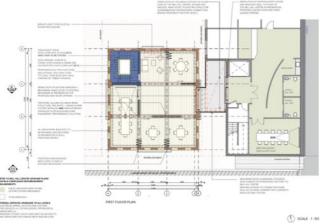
Proposed First Floor Plan, NTS. Archer Office
